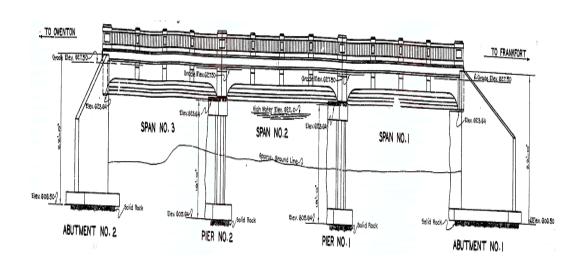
A typical full height closed or high abutment (bridge No. 094B00041N)
